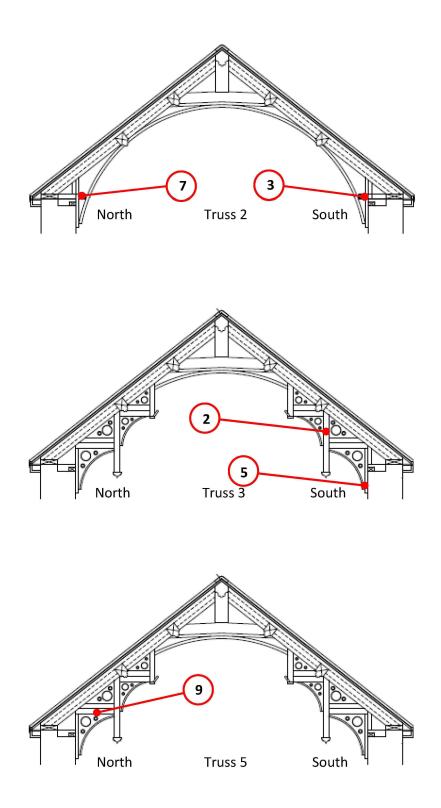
c: Sections through the nave roof trusses to locate sampled timbers
